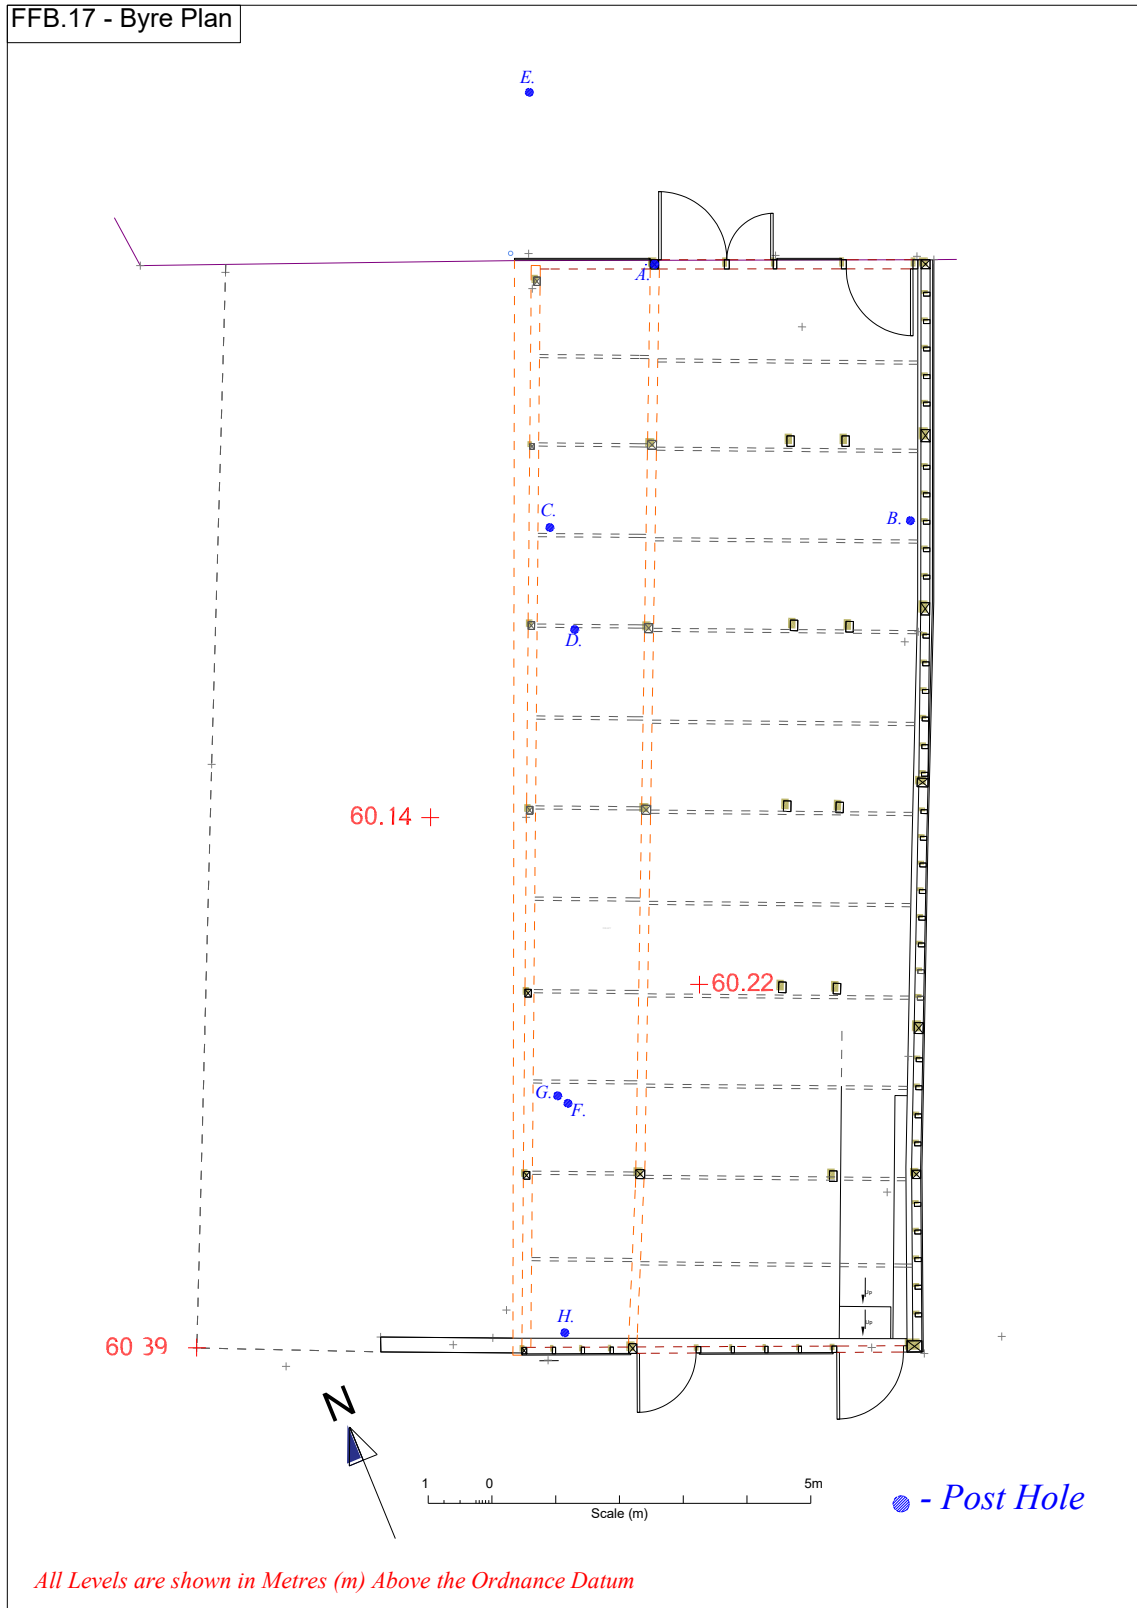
Plan of the postholes found in the Byre excavations superimposed over plan of the Byre
